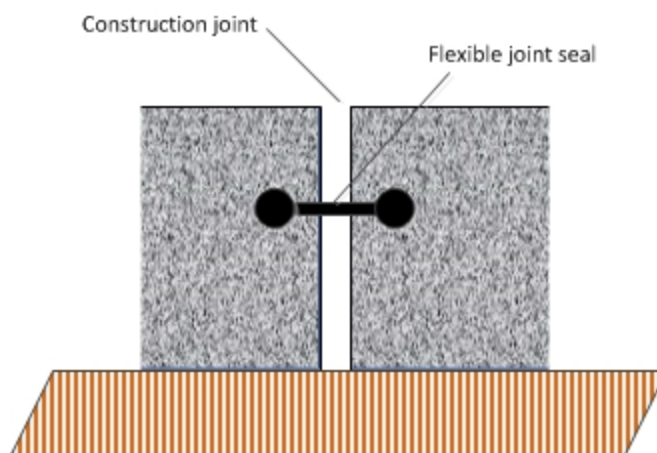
Flexible seal installed in concrete pavement construction joint to prevent water intrusion
